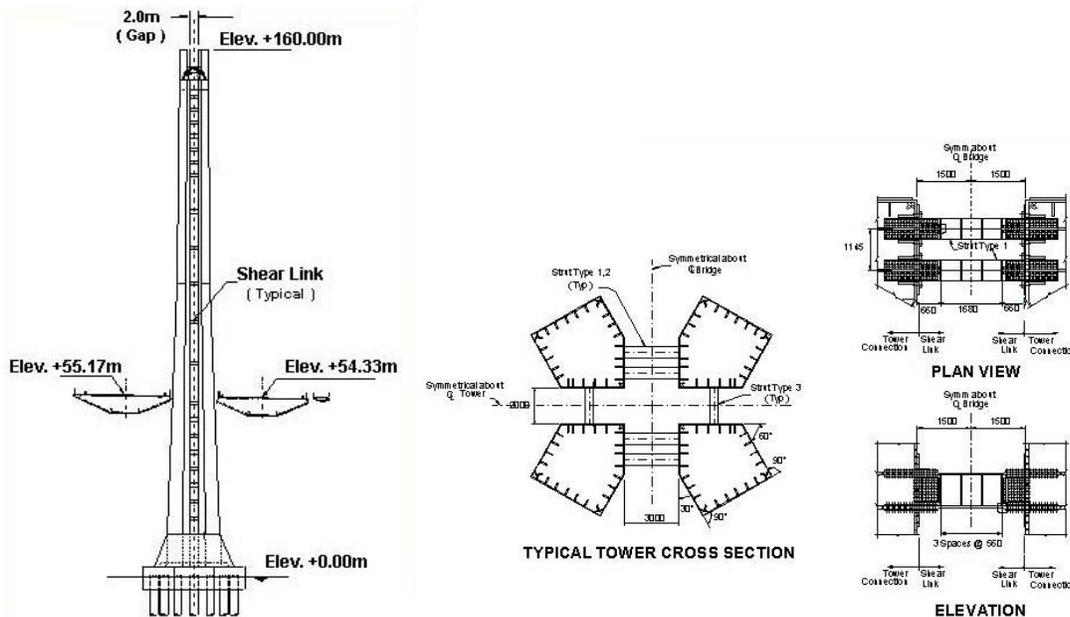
Elevation and Section of the Single Tower for the SFOBB Self-Anchored Suspension Bridge.
